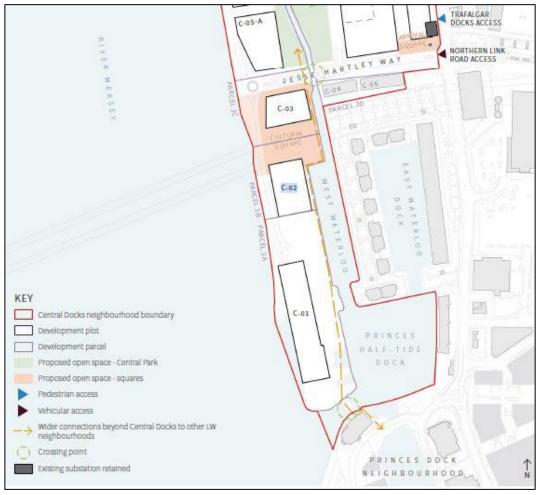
Extract of Base Plan from the Central Docks Masterplan showing C-02 and the partial infill of West Waterloo Dock
